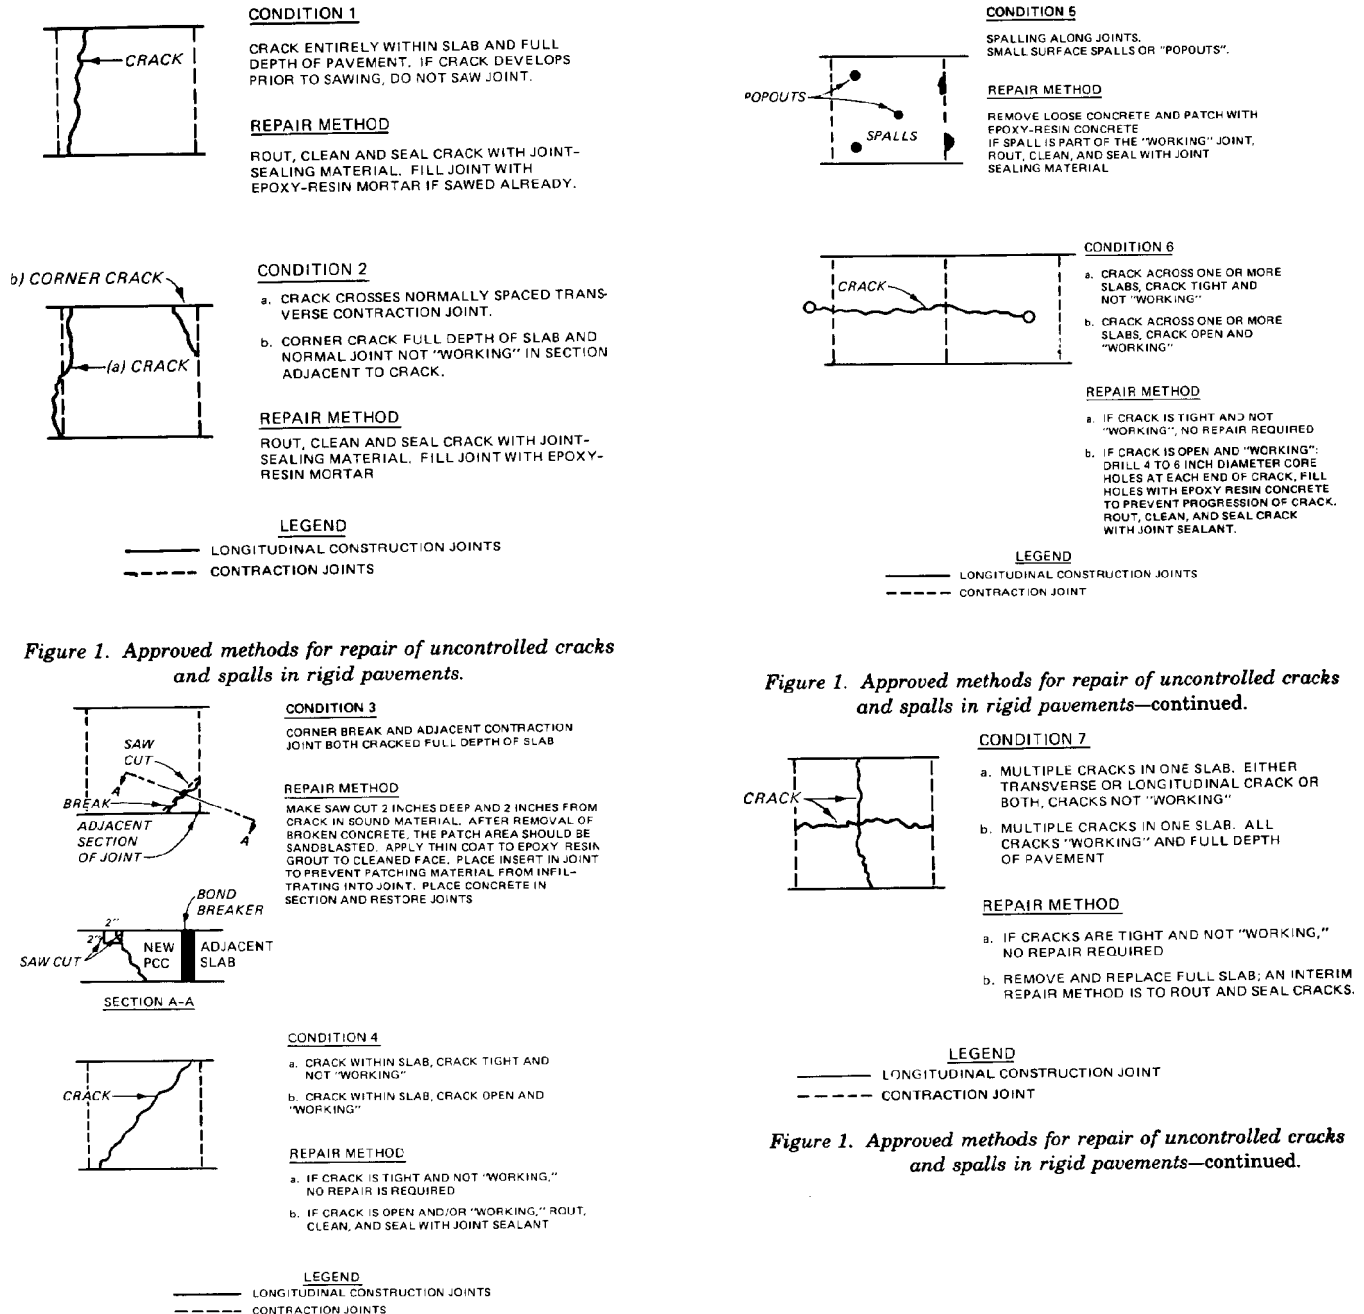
Approved methods for repair of uncontrolled cracks and spalls in rigid pavements.
